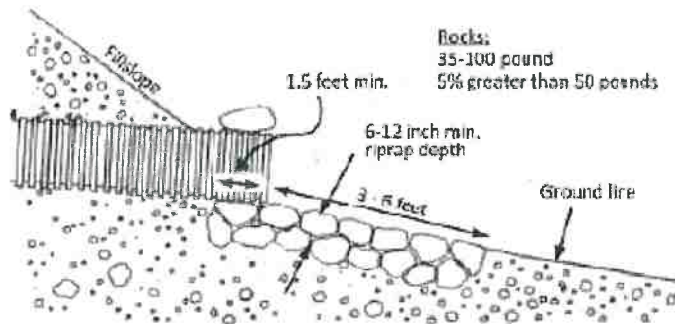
A. Riprap armor at culvert outlet (Modified from: Keller et al., 2011).
